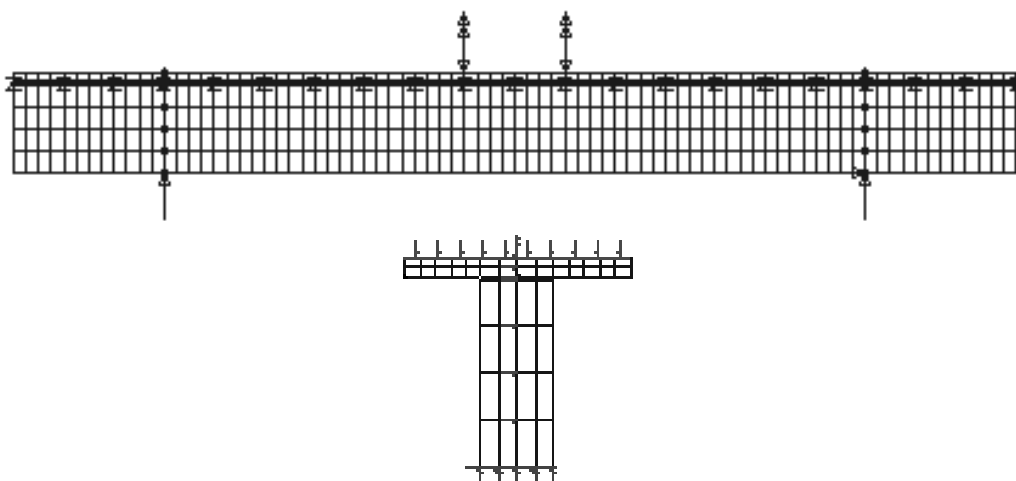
The mesh used for Specimen 2 in the FEM analysis, elevation and cross-section.
